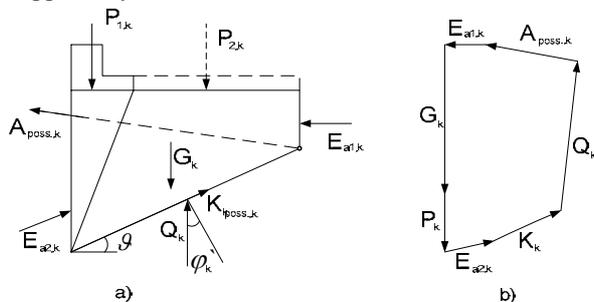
Force determination for the anchor A: (a) forces acting on the soil block sliding and (b) polygon of forces (EAB 2008)
